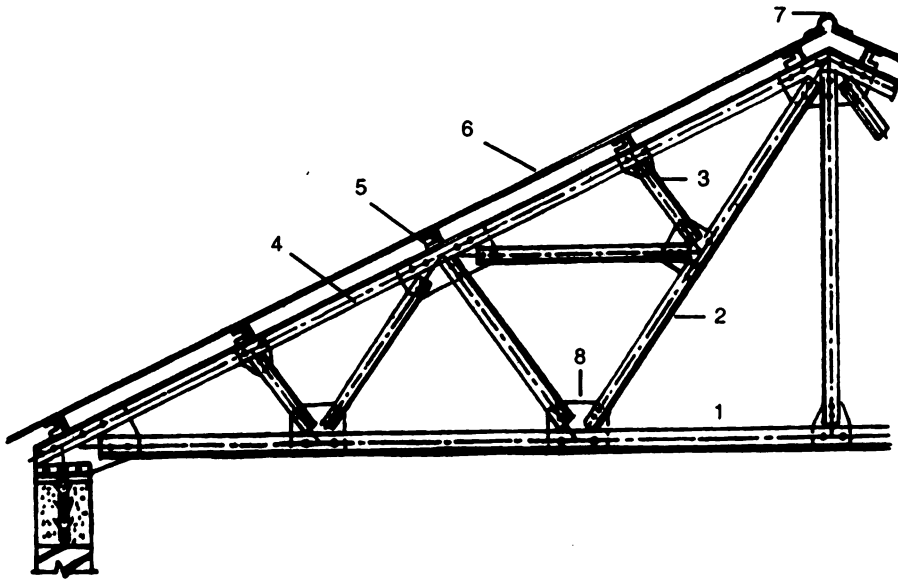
Typical steel roof truss for sloping roofs for factory buildings: 1. Main tie, 2. Ties (members in tension), 3. Struts (members in compression), 4. Principal rafter, 5. Purlin with cleats, 6. AC sheets, 7. AC ridge, 8. Gusset plate.
